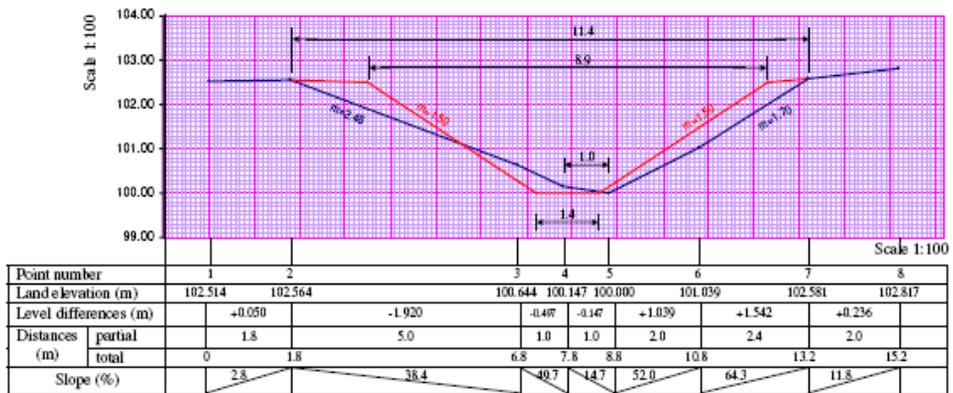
Transversal section (I) through the „Stejăroaia” main outlet channel
